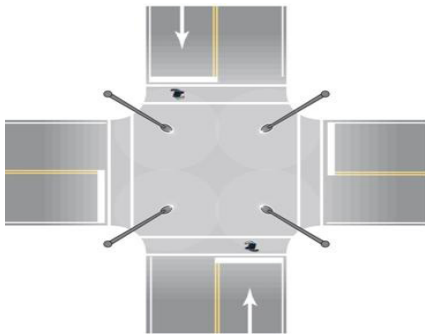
Traditional intersection lighting layout, Source: FHWA Report on Lighting Design for Crosswalks, April 2008.
